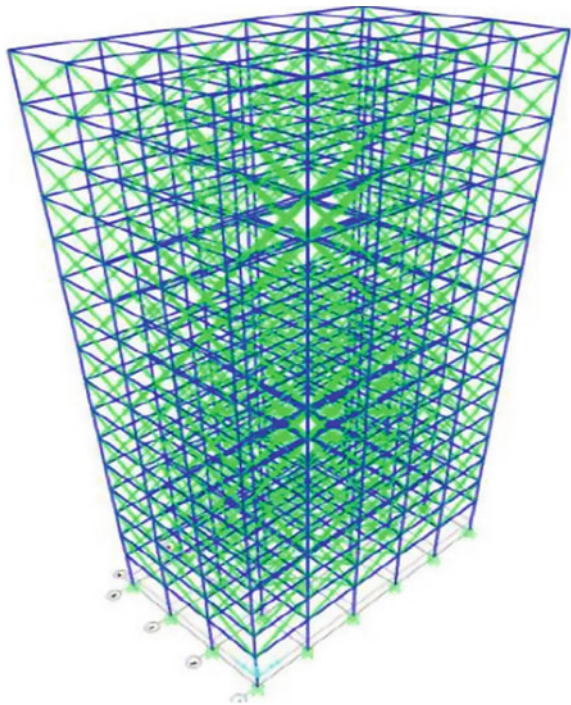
3D view of G+15 storey building with infill wall with viscoelastic damper at 1st and 2nd position
